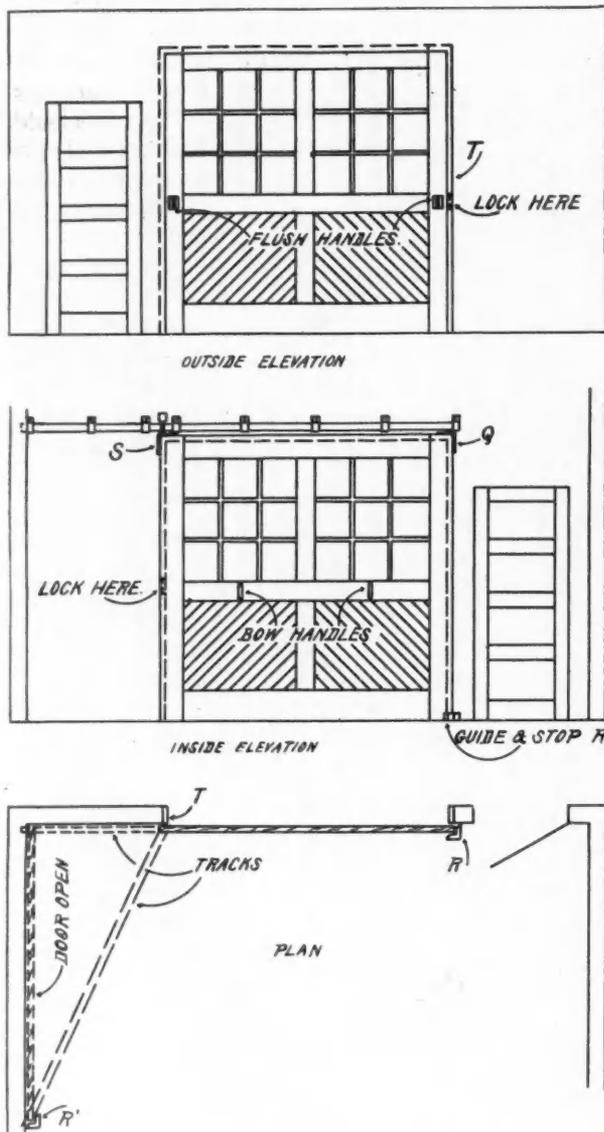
Outside and Inside Elevations and Plan of Right Angle Garage Door.
